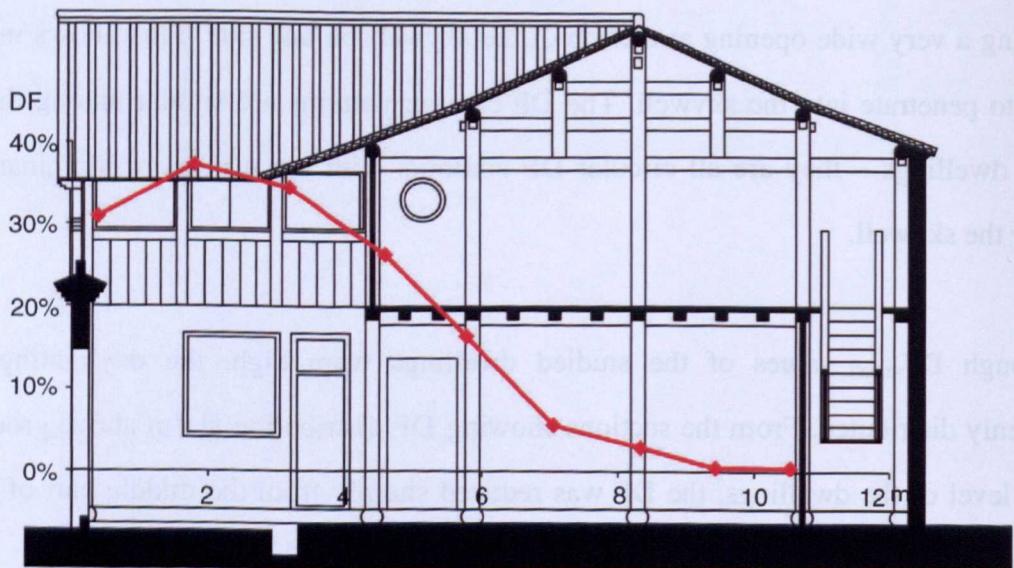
Section showing DF at 1m above ground floor level of Yufengfa dwelling
